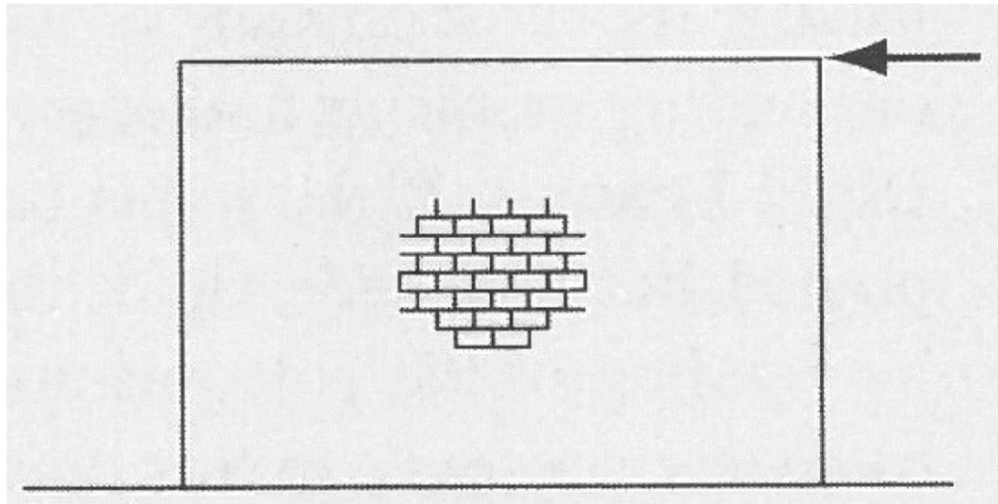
Shear wall for stabilizing structures (Wyatt, K., Hough, R. 2013)
